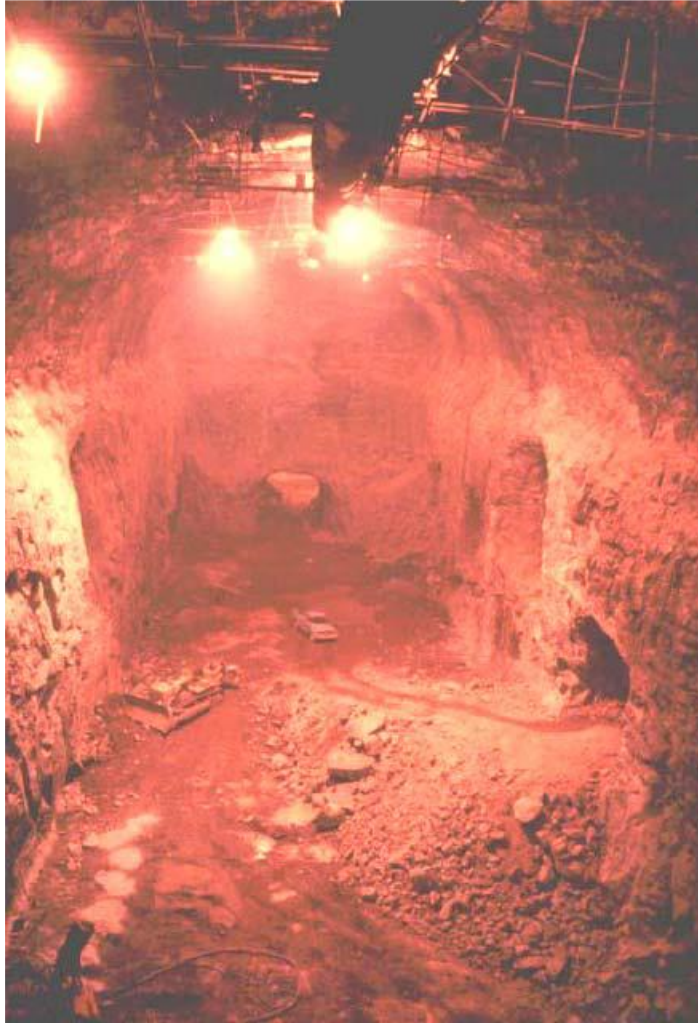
The Under Construction Cavern of the Underground Hydropower Plant in Rio Grande (Source: Kaliampakos, 2009).
